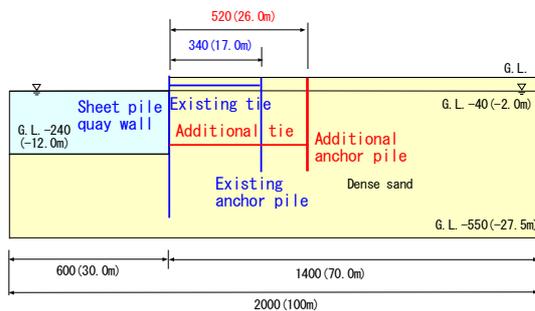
Model P1 (Horizontal reinforcement tie)
